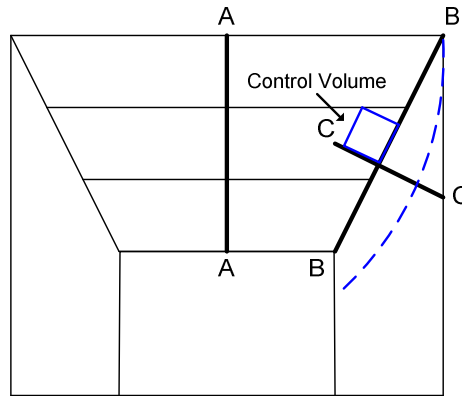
Plan view of stepped spillway with sloped training walls.
